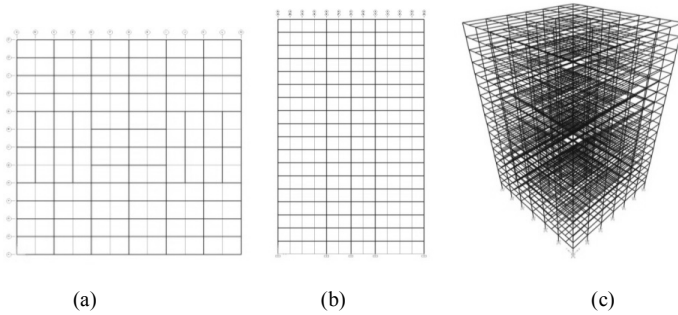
General view of the calculation model: (a) the plan of the building; (b) cross-section; (c) 3D view
